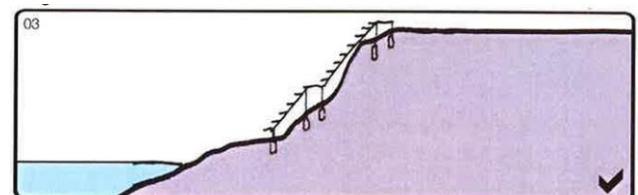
j: New access stairways should have minimal disruption to the landform. They should be lightweight and constructed from steel or timber.(I)
